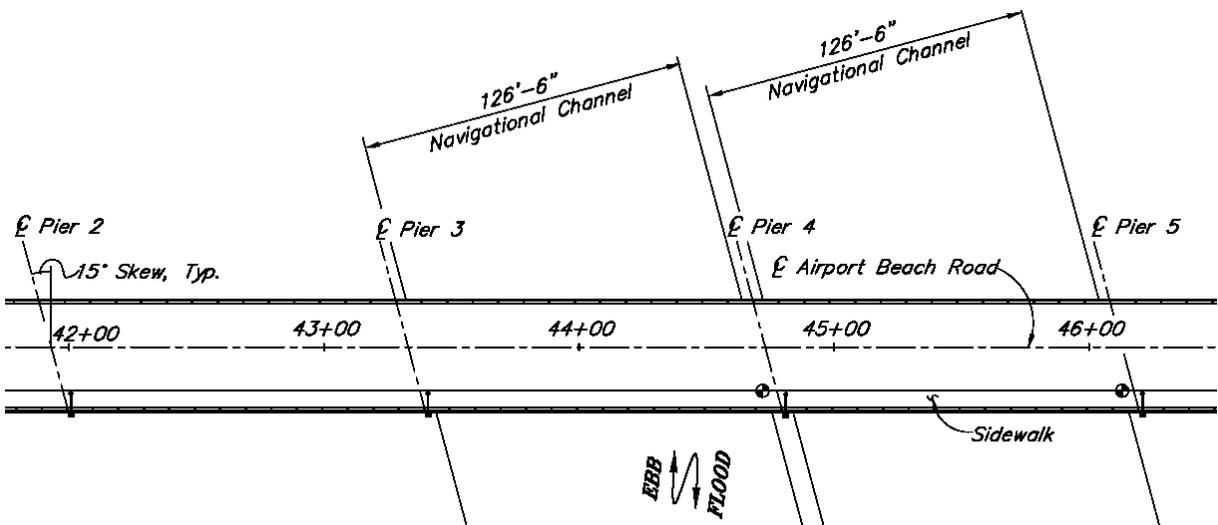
Bridge plan view indicating multiple navigation channel width dimensions to substructure units in the waterway. (Source: Alaska DOT)
